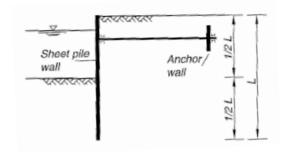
Principle of a anchored sheet pile wall with anchor wall
